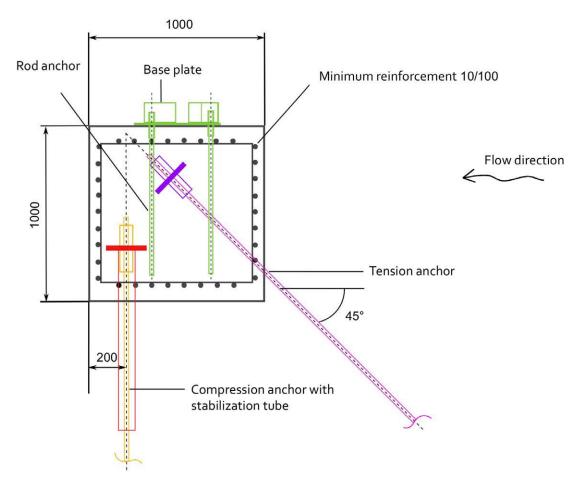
Side view of a reinforced concrete foundation with one pressure and two tension anchors, based on [15].
